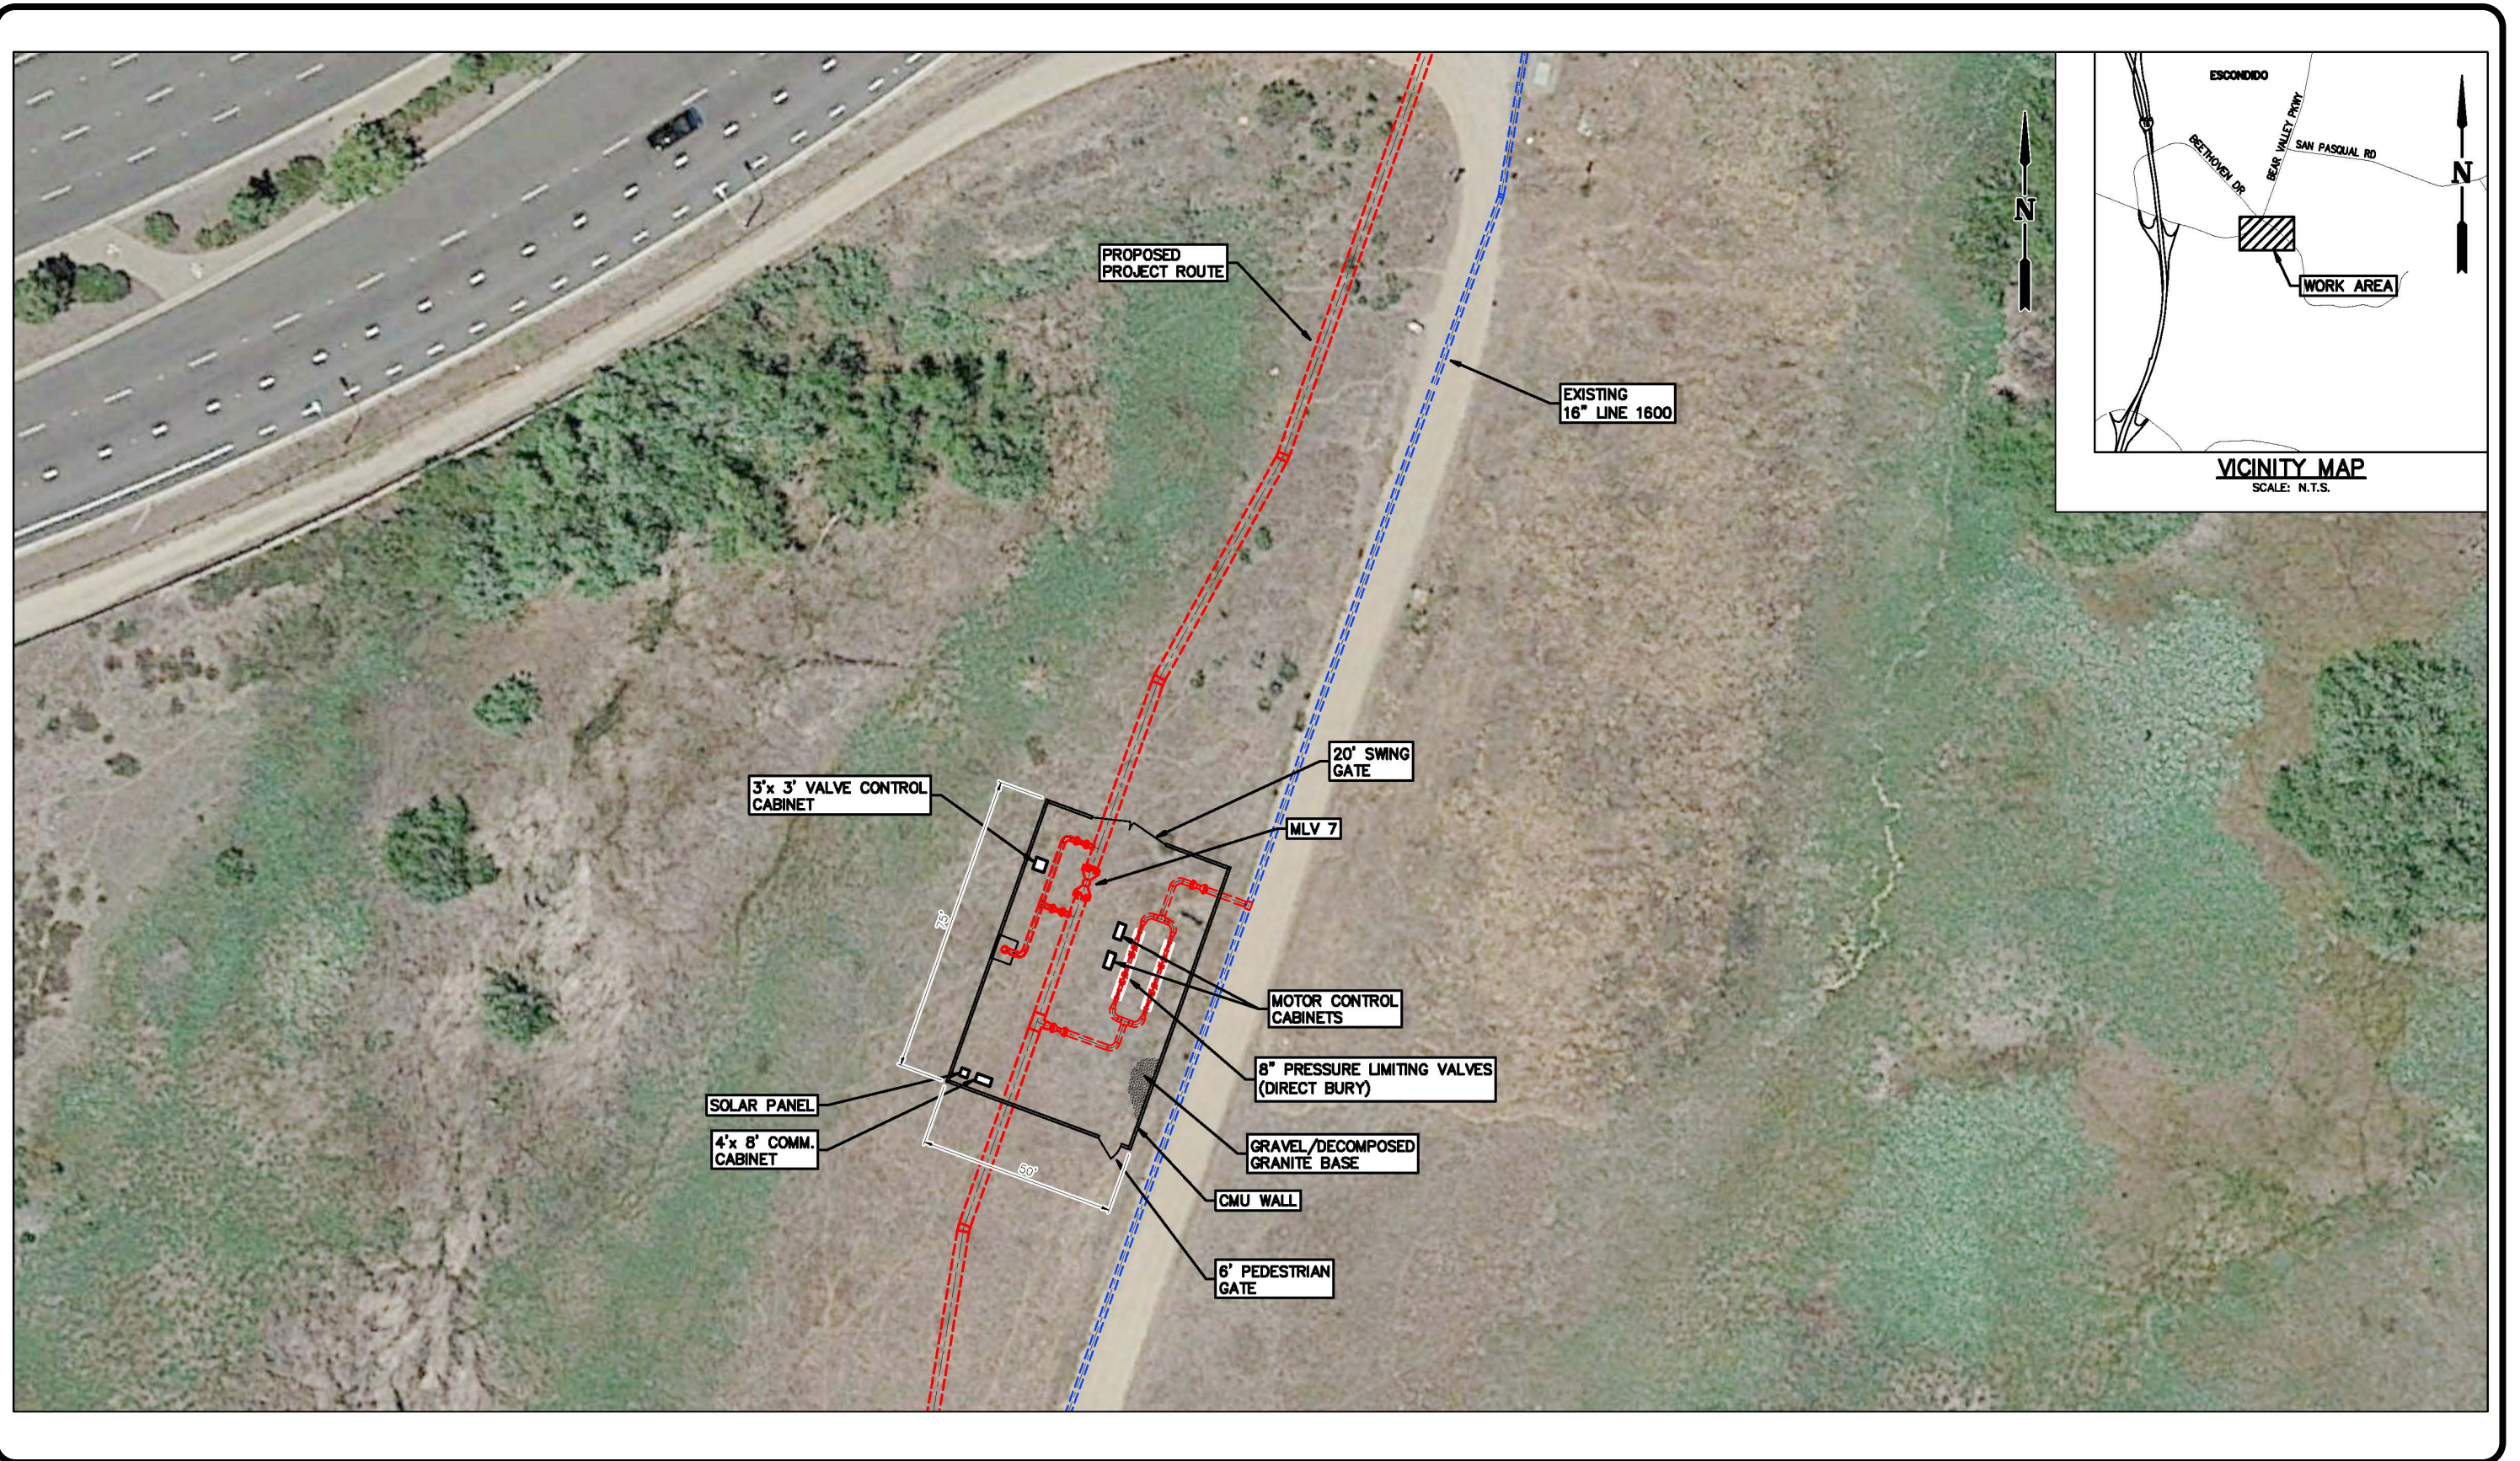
Line 1600 Cross-tie Site Plan
